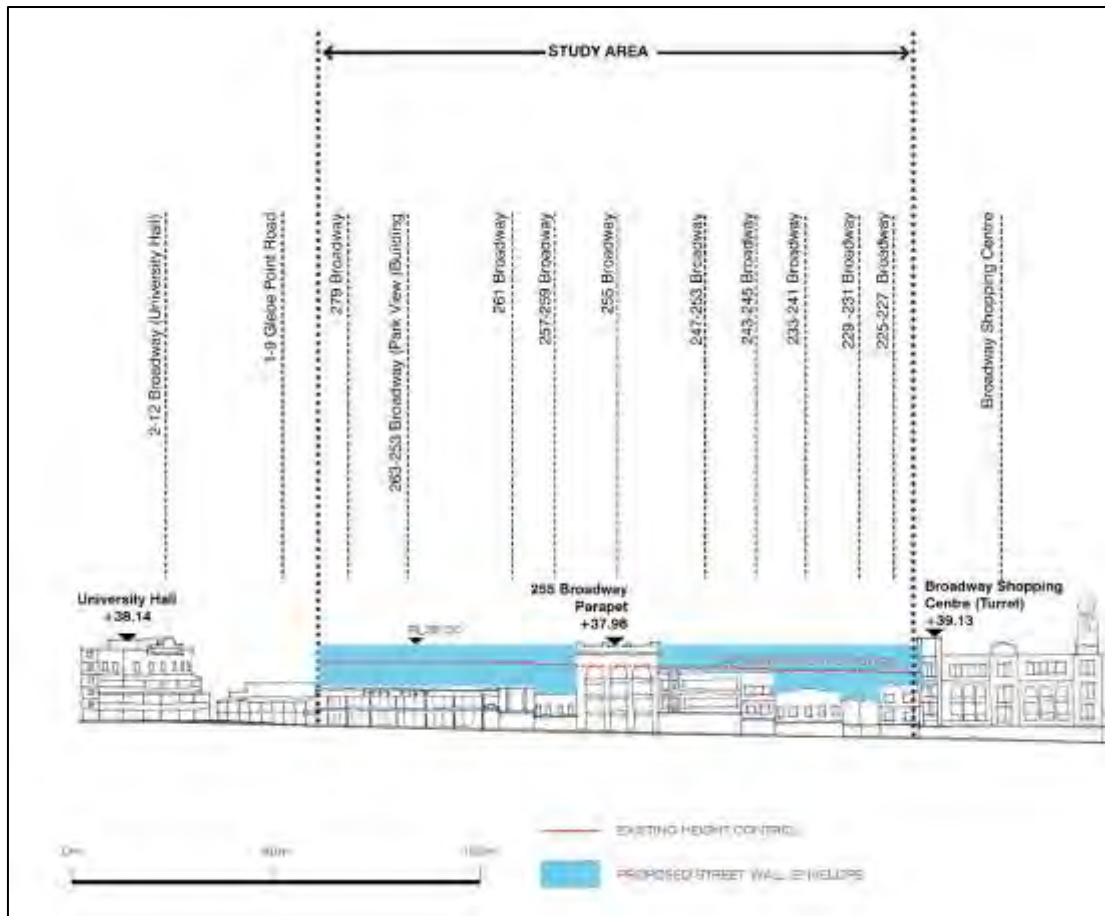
Proposed building envelope looking west along Broadway from City Road
